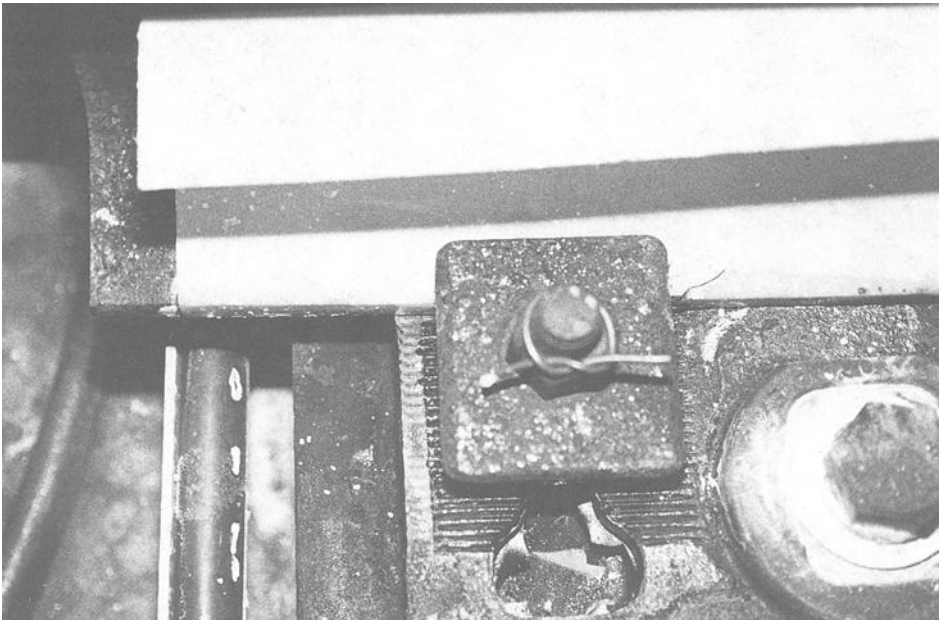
Photograph of Cracking on Plastic Insulator During Laboratory Testing (Right Side of Rail Clip).
